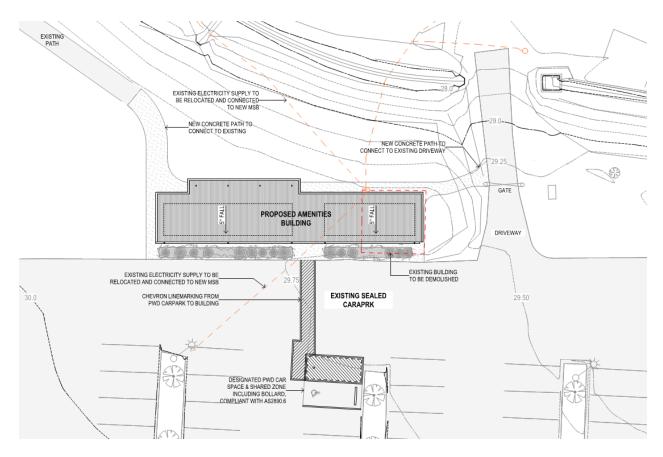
Indicative Building and Disabled Carpark Location Plan
